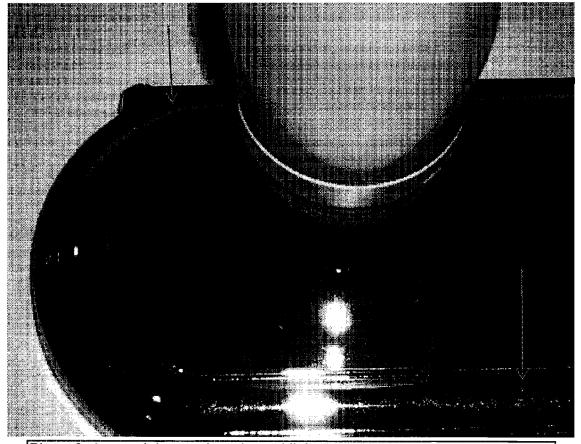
shows pitting on the mirrored light fixture in the master bathroom.
